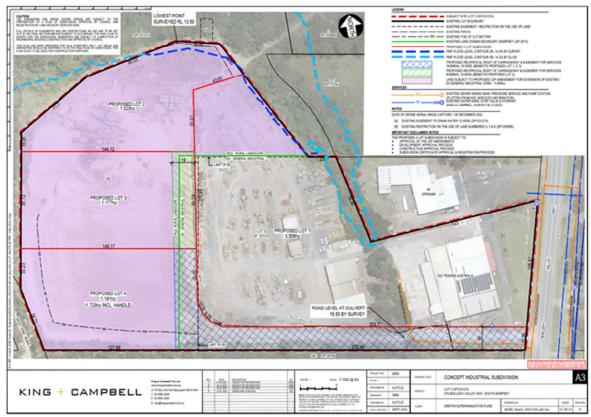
Concept Planning Proposal with PMF of 14.3m AHD Affectation
